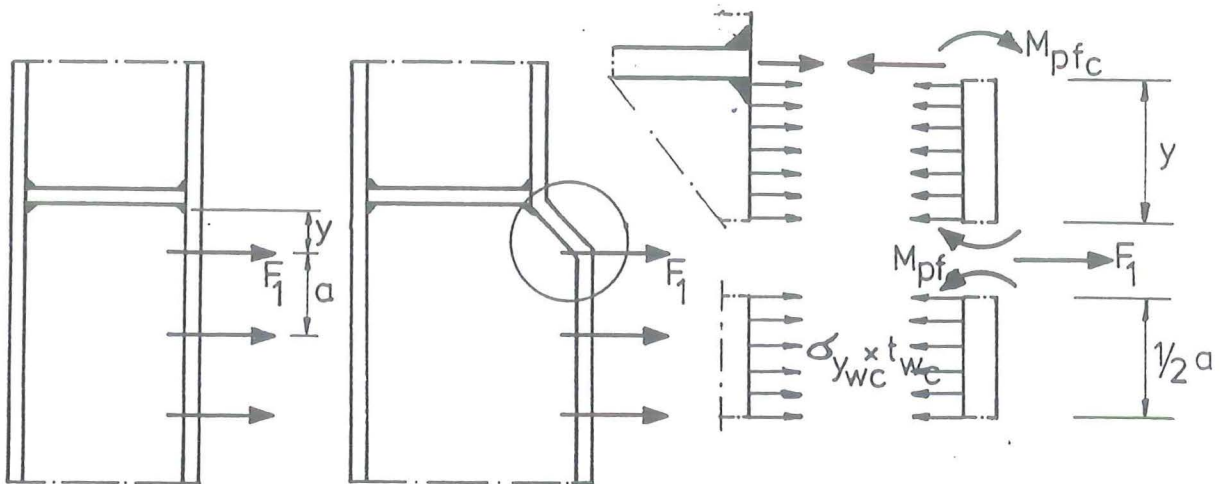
Failure of the column-web due to tension in the situation with stiffened flanges.
